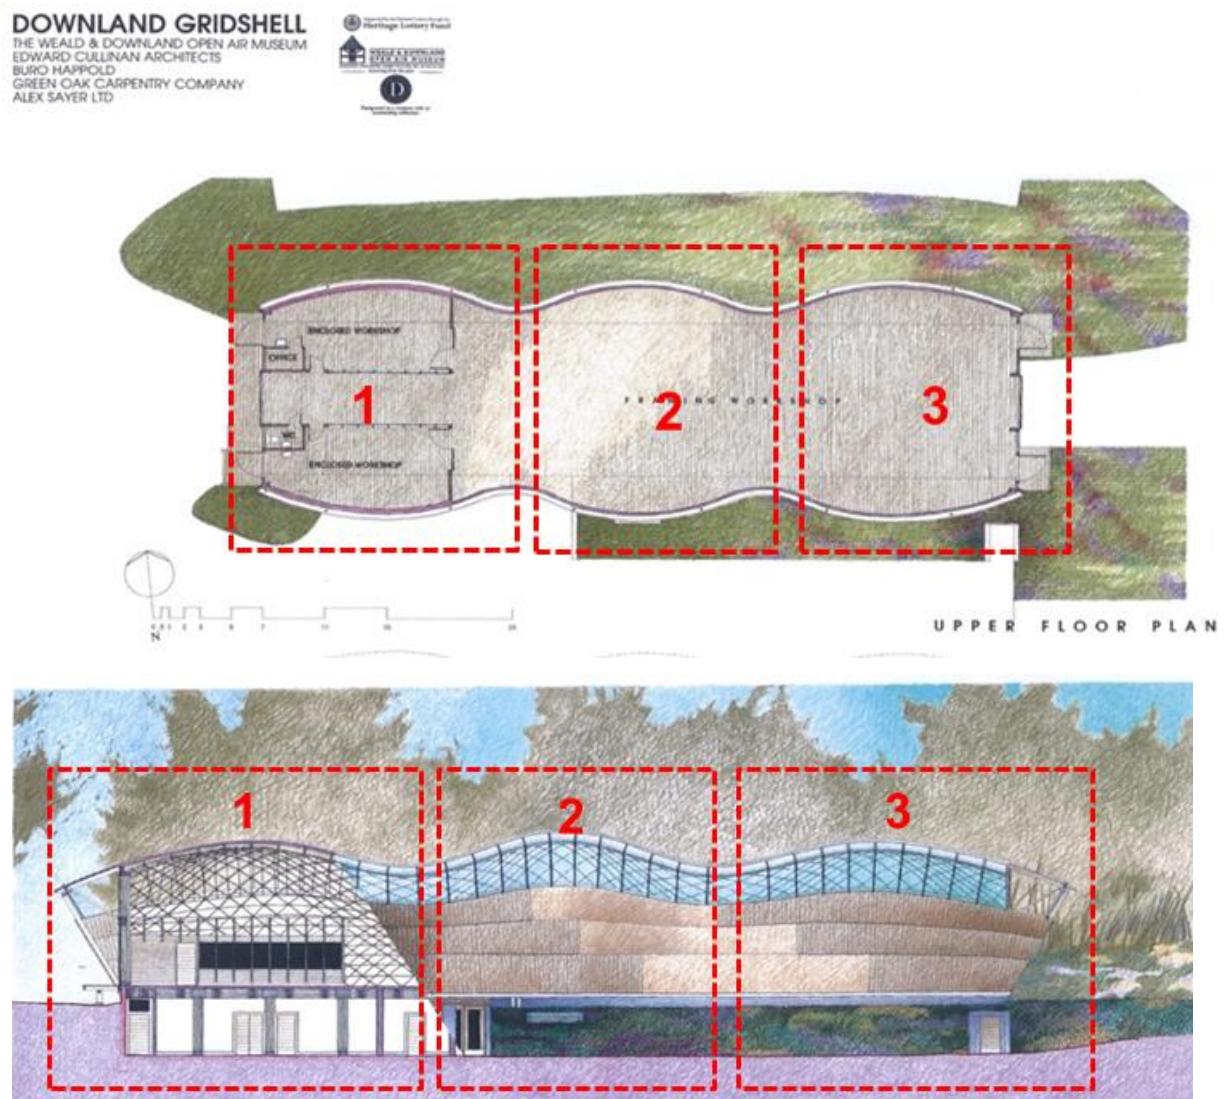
Existing timber gridshell transfers load and stabilized by a floating timber floor that transfers load onto the concrete plinth.
